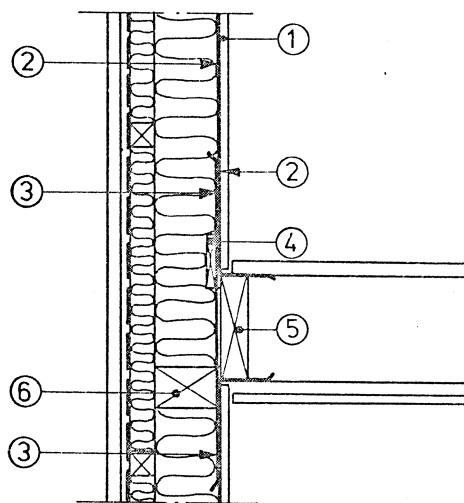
Vertical section through the junction between the gable wall and the attic floor
